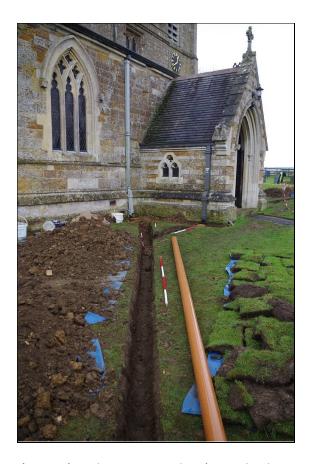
Drain Trench 3 (centre) and Drain Trench 4 (on right, by porch), looking SW.
